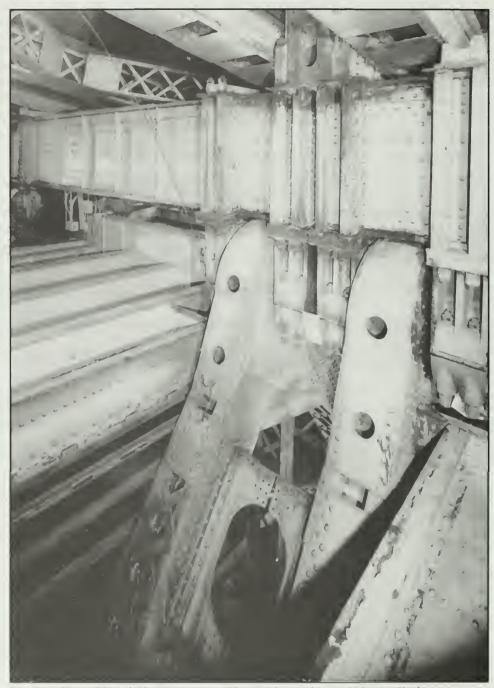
Michigan Avenue: Chicago River Bridge (1920), detail of trunnion girder, Chicago. Photo by Jet Lowe, HAER.
